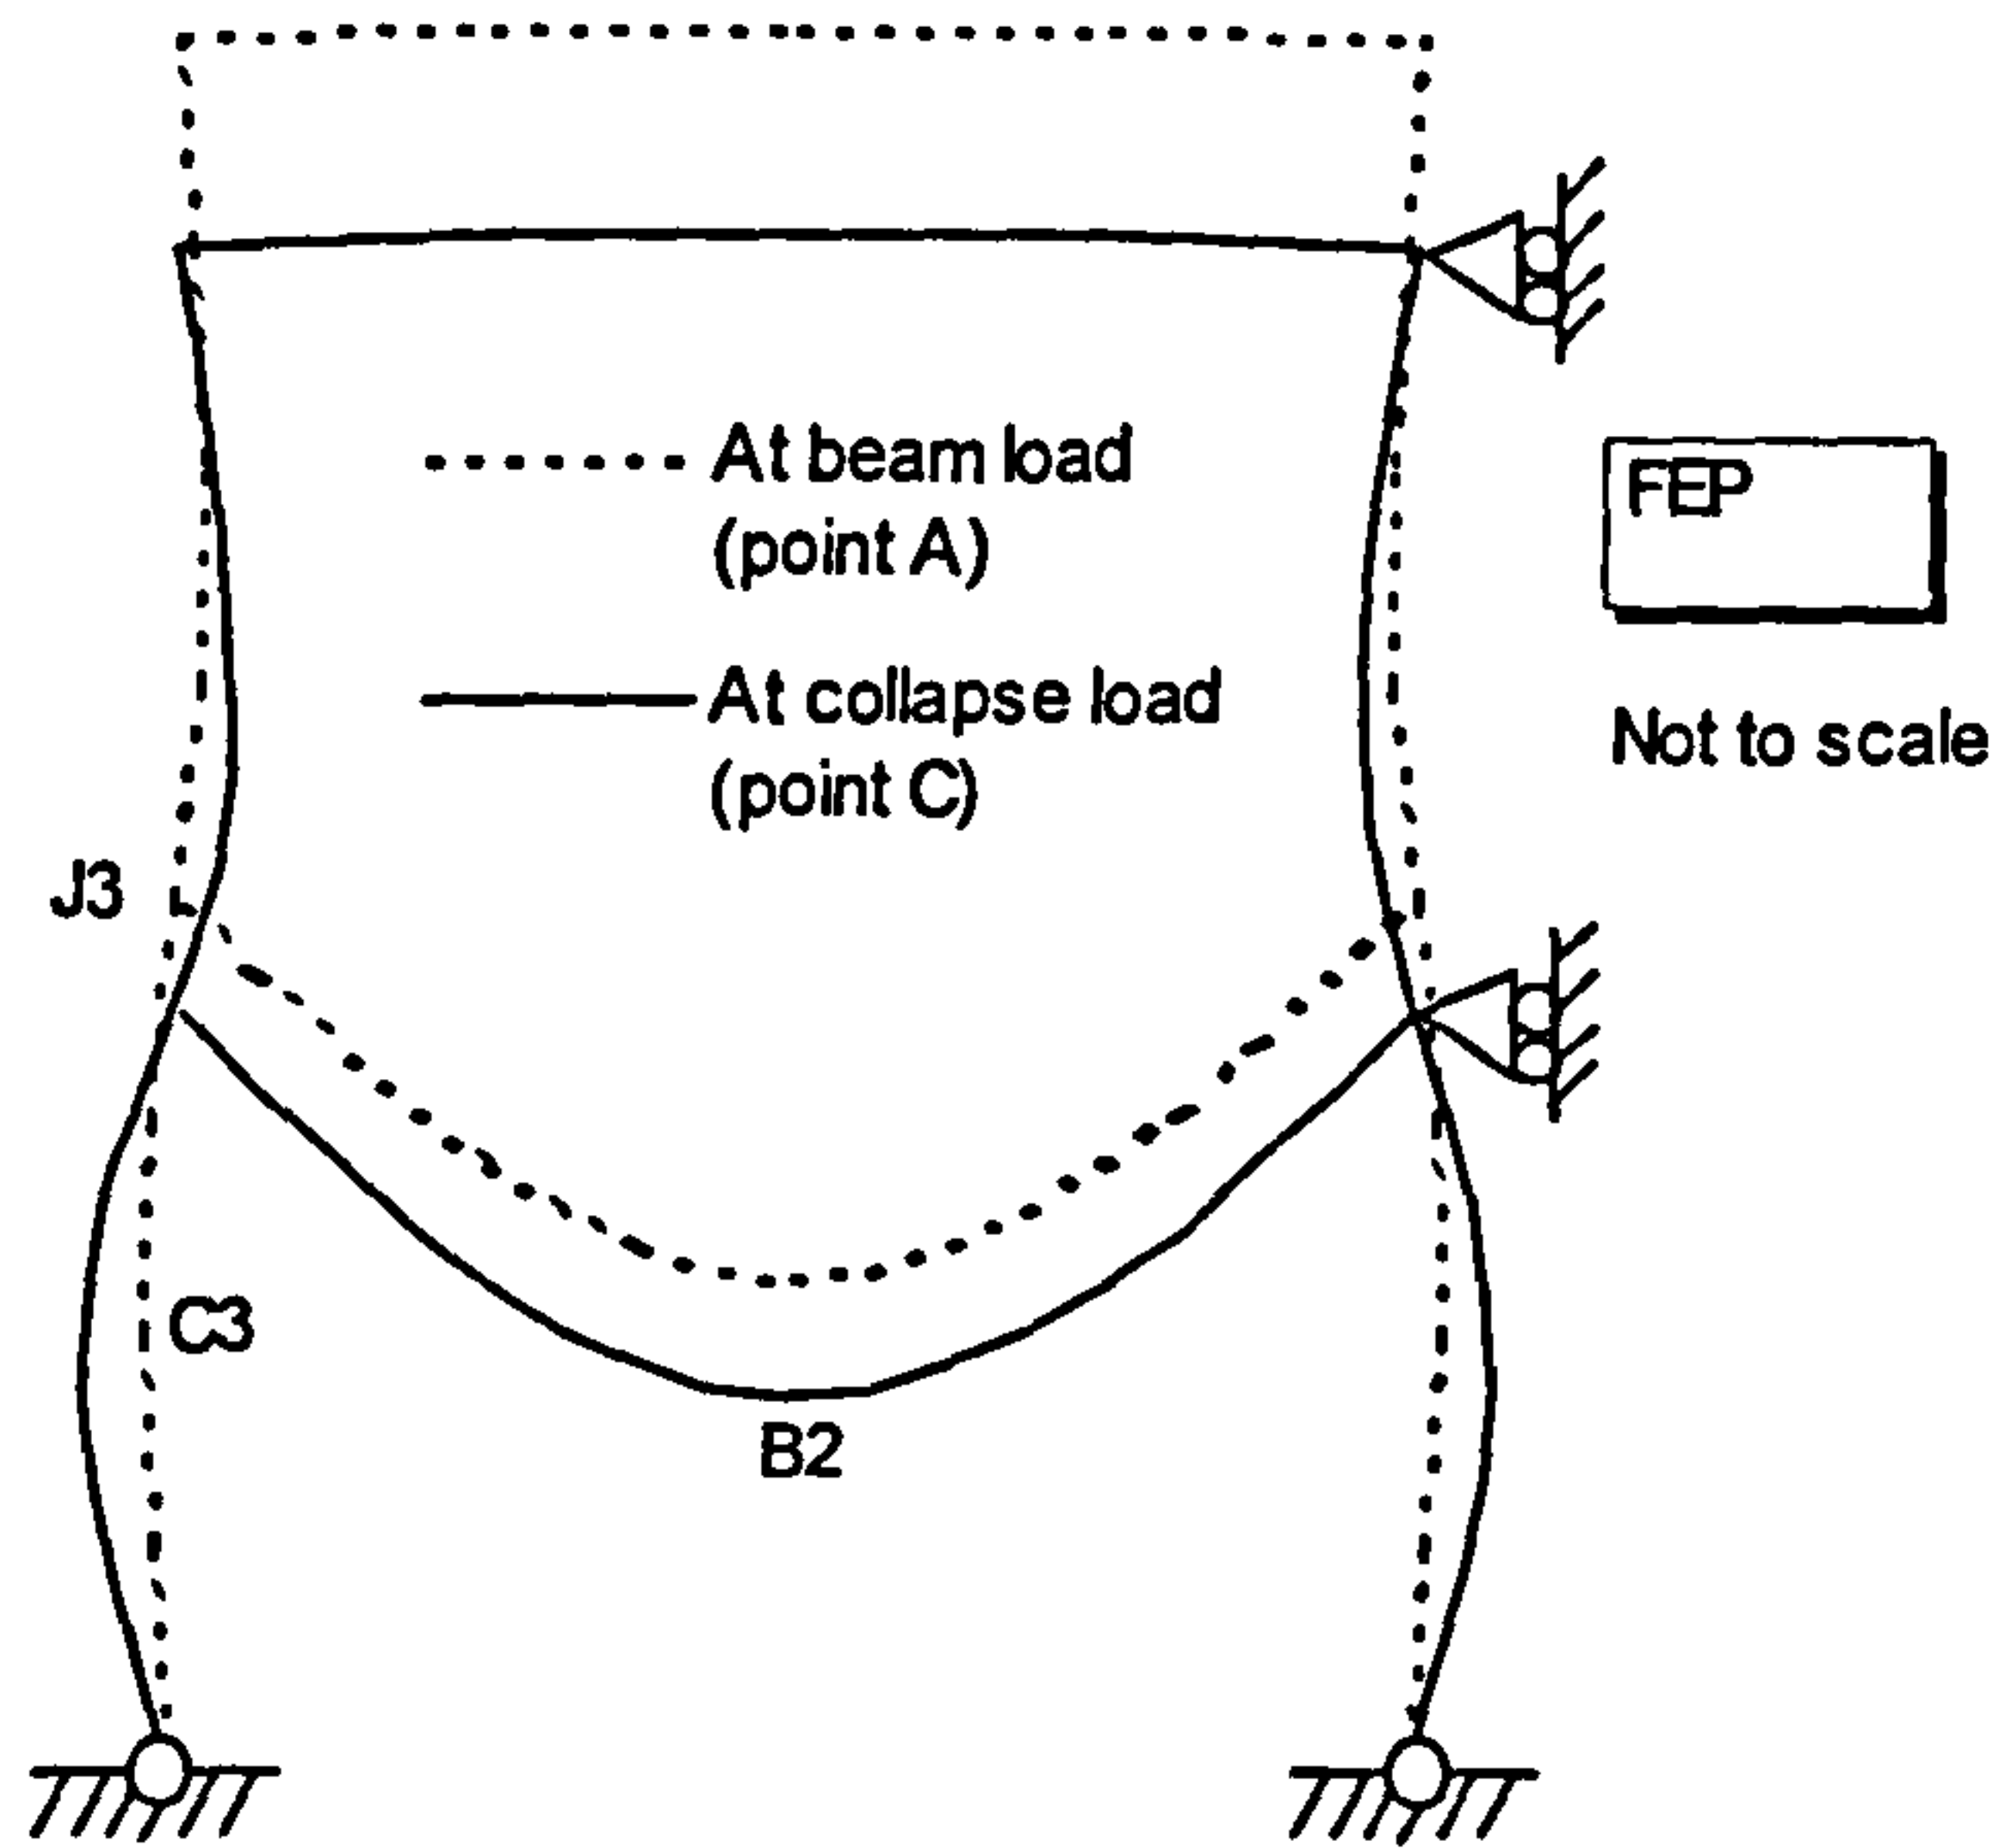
Exaggerated deformed shape of frame with FEP connections
